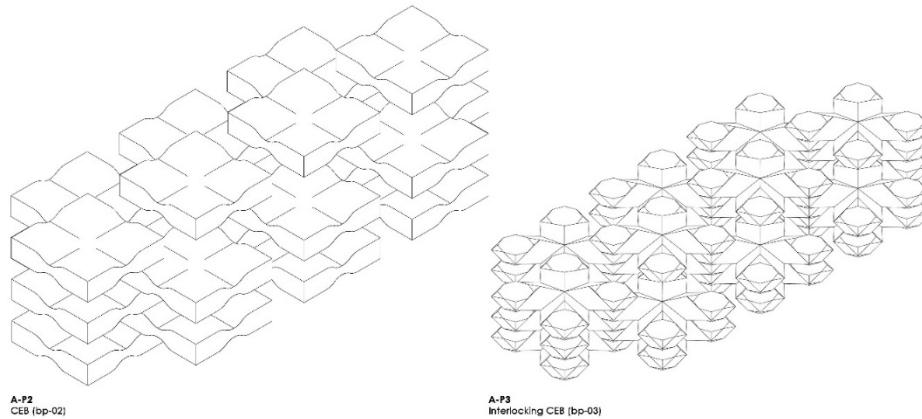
Vertical and horizontal expansion of prototyped assemblies for investigating block engagements and dependencies
